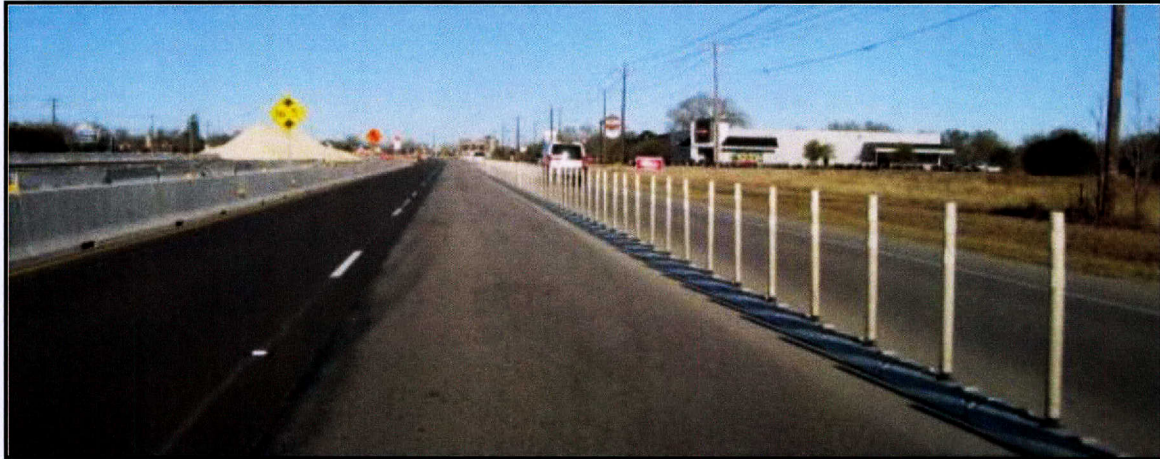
Pylons Used in a Work Zone to Separate Mainlanes and Frontage Road.
